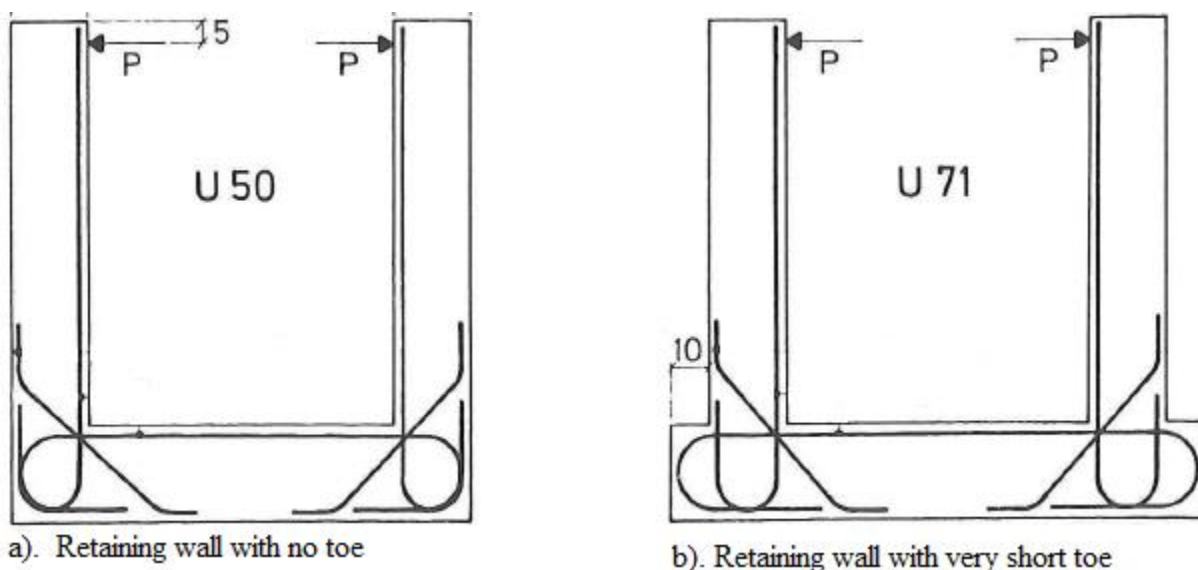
Reinforcement layout for retaining walls with short toe (Nilsson, 1973)
